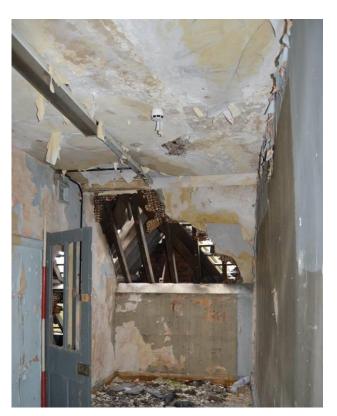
Room S13 looking north to the gable on the front projecting bay. Scale 2m. Facing north west.
